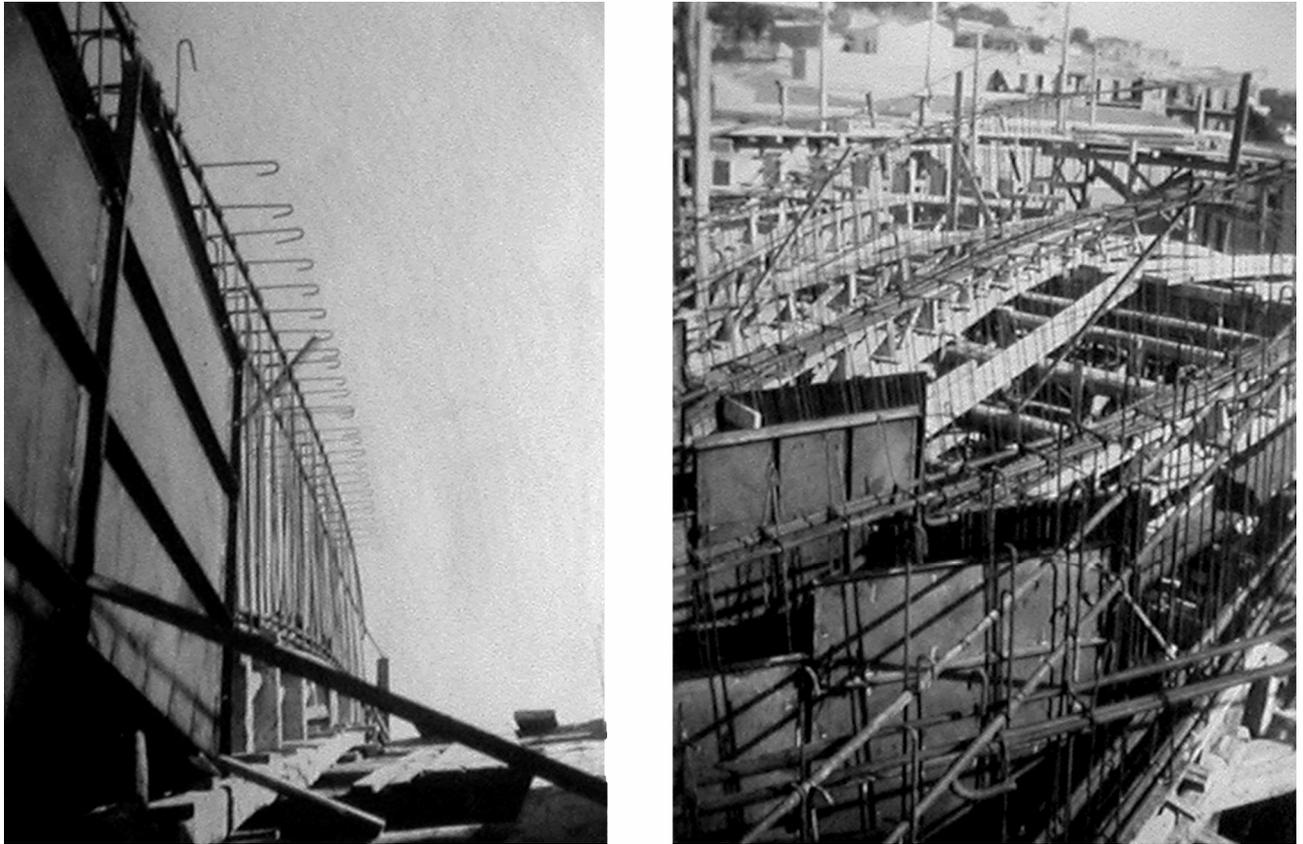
Wooden and metal formwork and reinforcement disposition for the main nave roof beams
